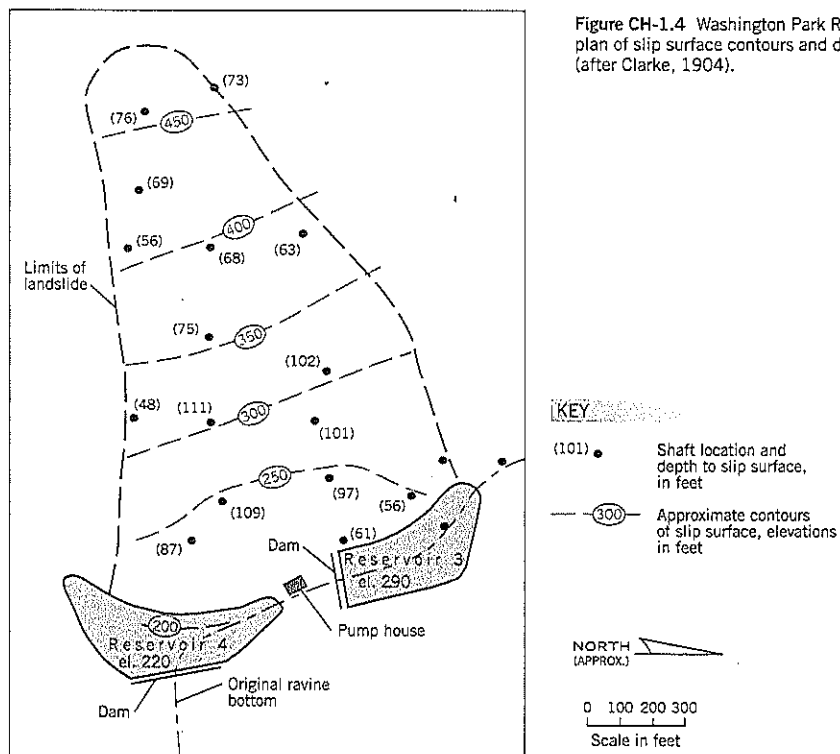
Washington Park Reservoirs Slide. Site plan of slip surface contours and depth of overburden (after Clarke, 1904).
